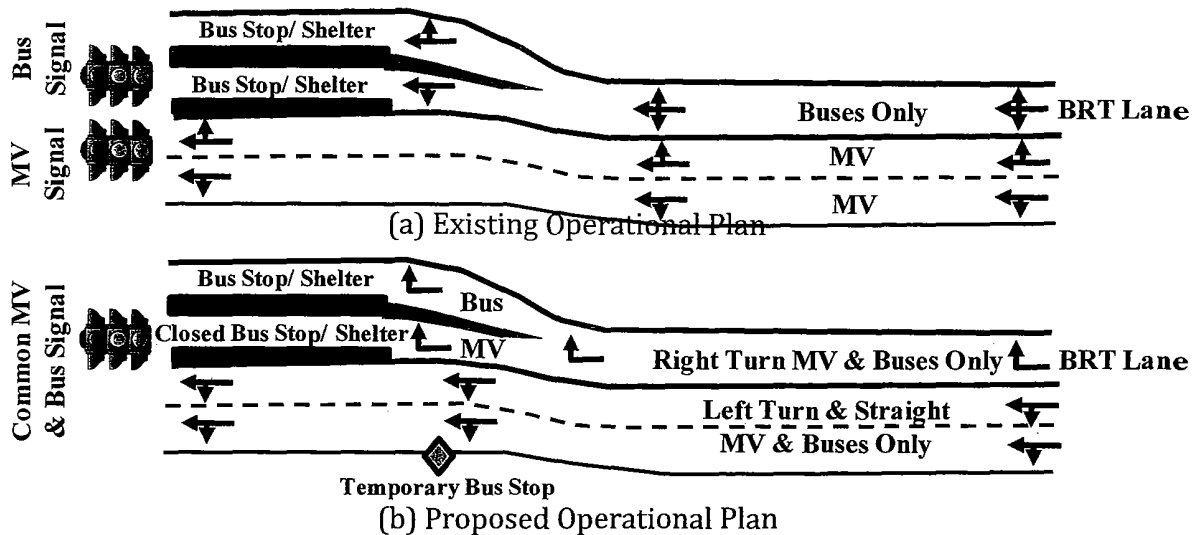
Typical operation plan of Existing and Proposed Experimental Run on BRT Corridor
